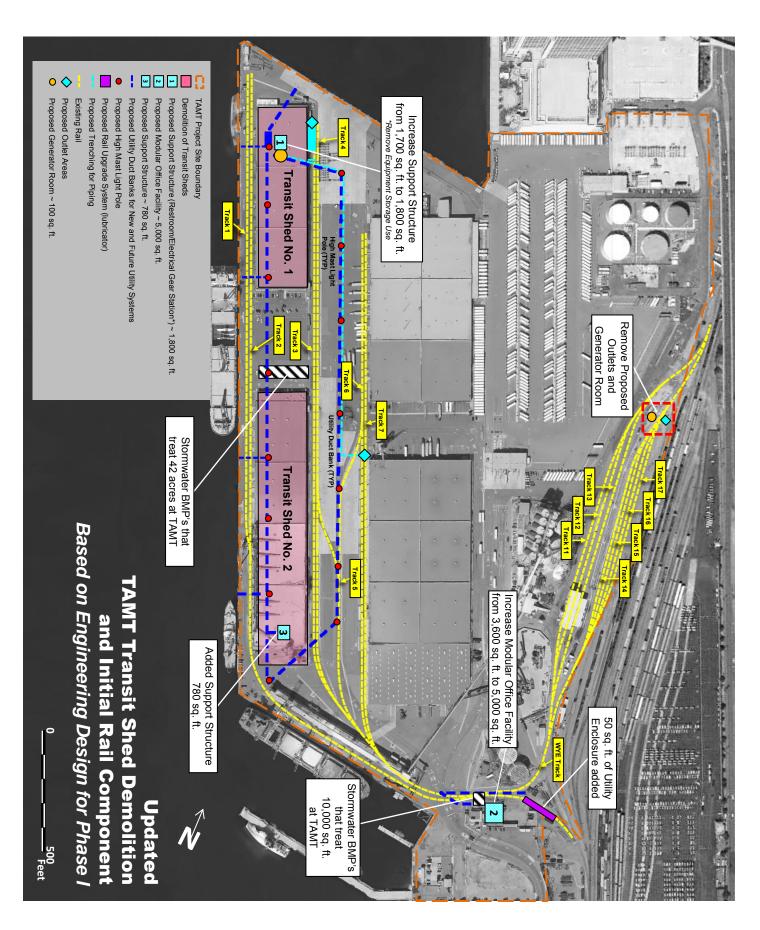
Site Plan showing changes to Demolition and Initial Rail Component Project
